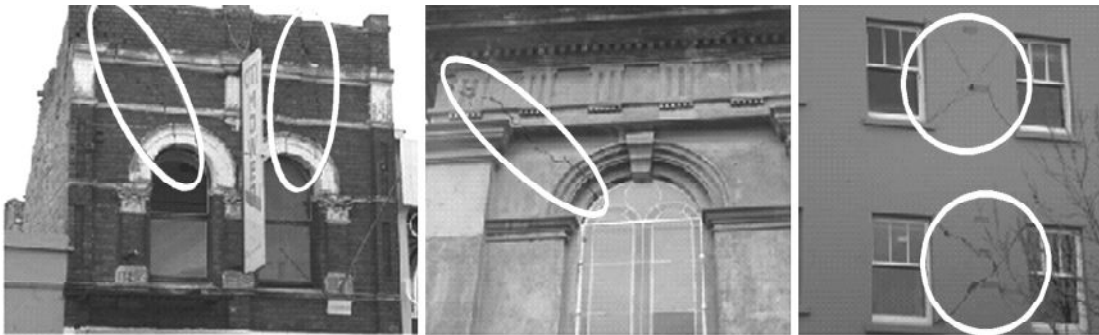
Typical in-plane failure of masonry walls in the September 2010 earthquake.
